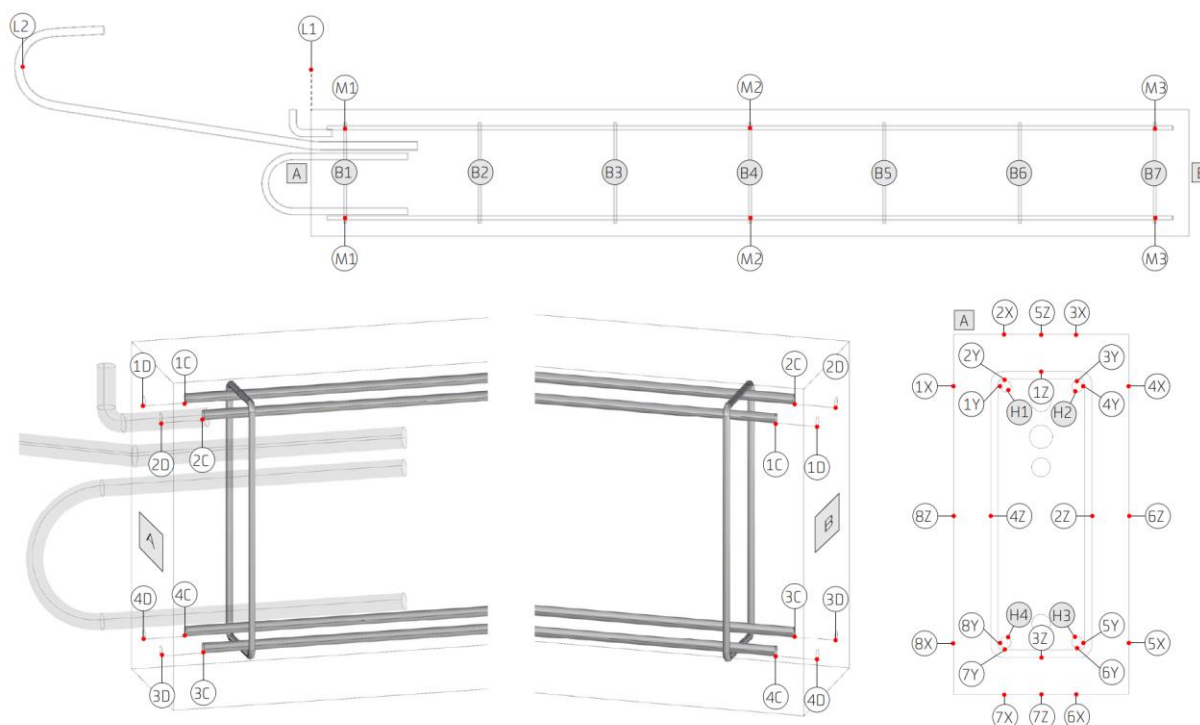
Drawing defining points on the inside of the formwork and on the outside of the reinforcement used to document the cover to reinforcement prior to casting of the concrete elements.
